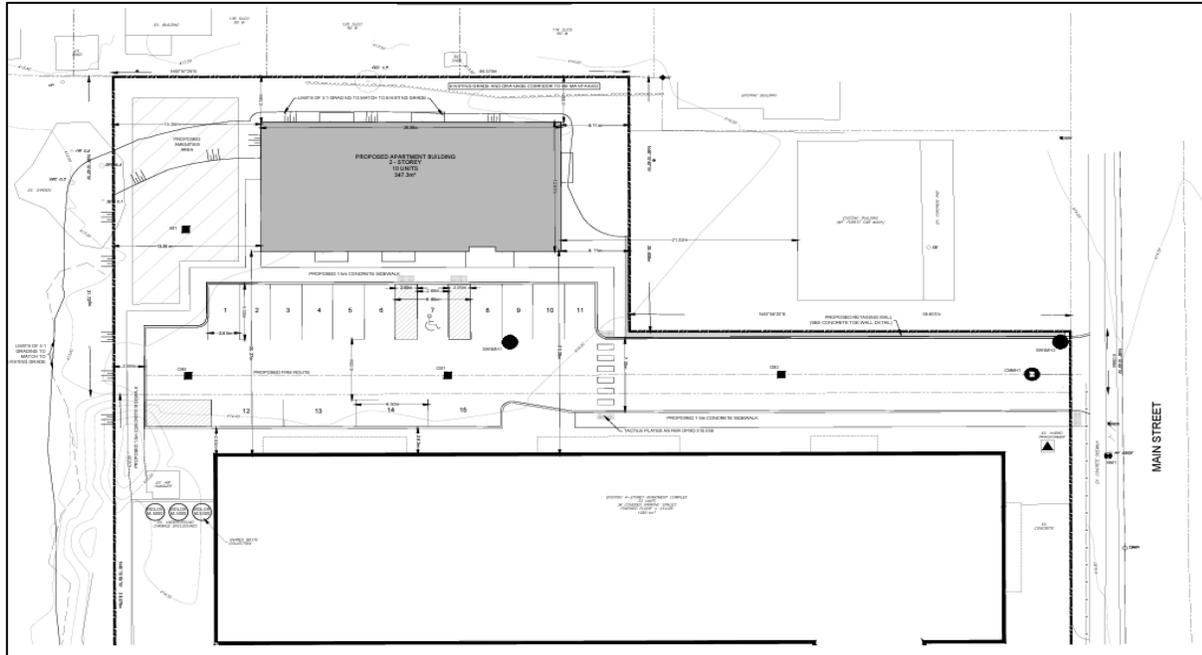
Site plan submitted by Cobide Engineering, April 2024
